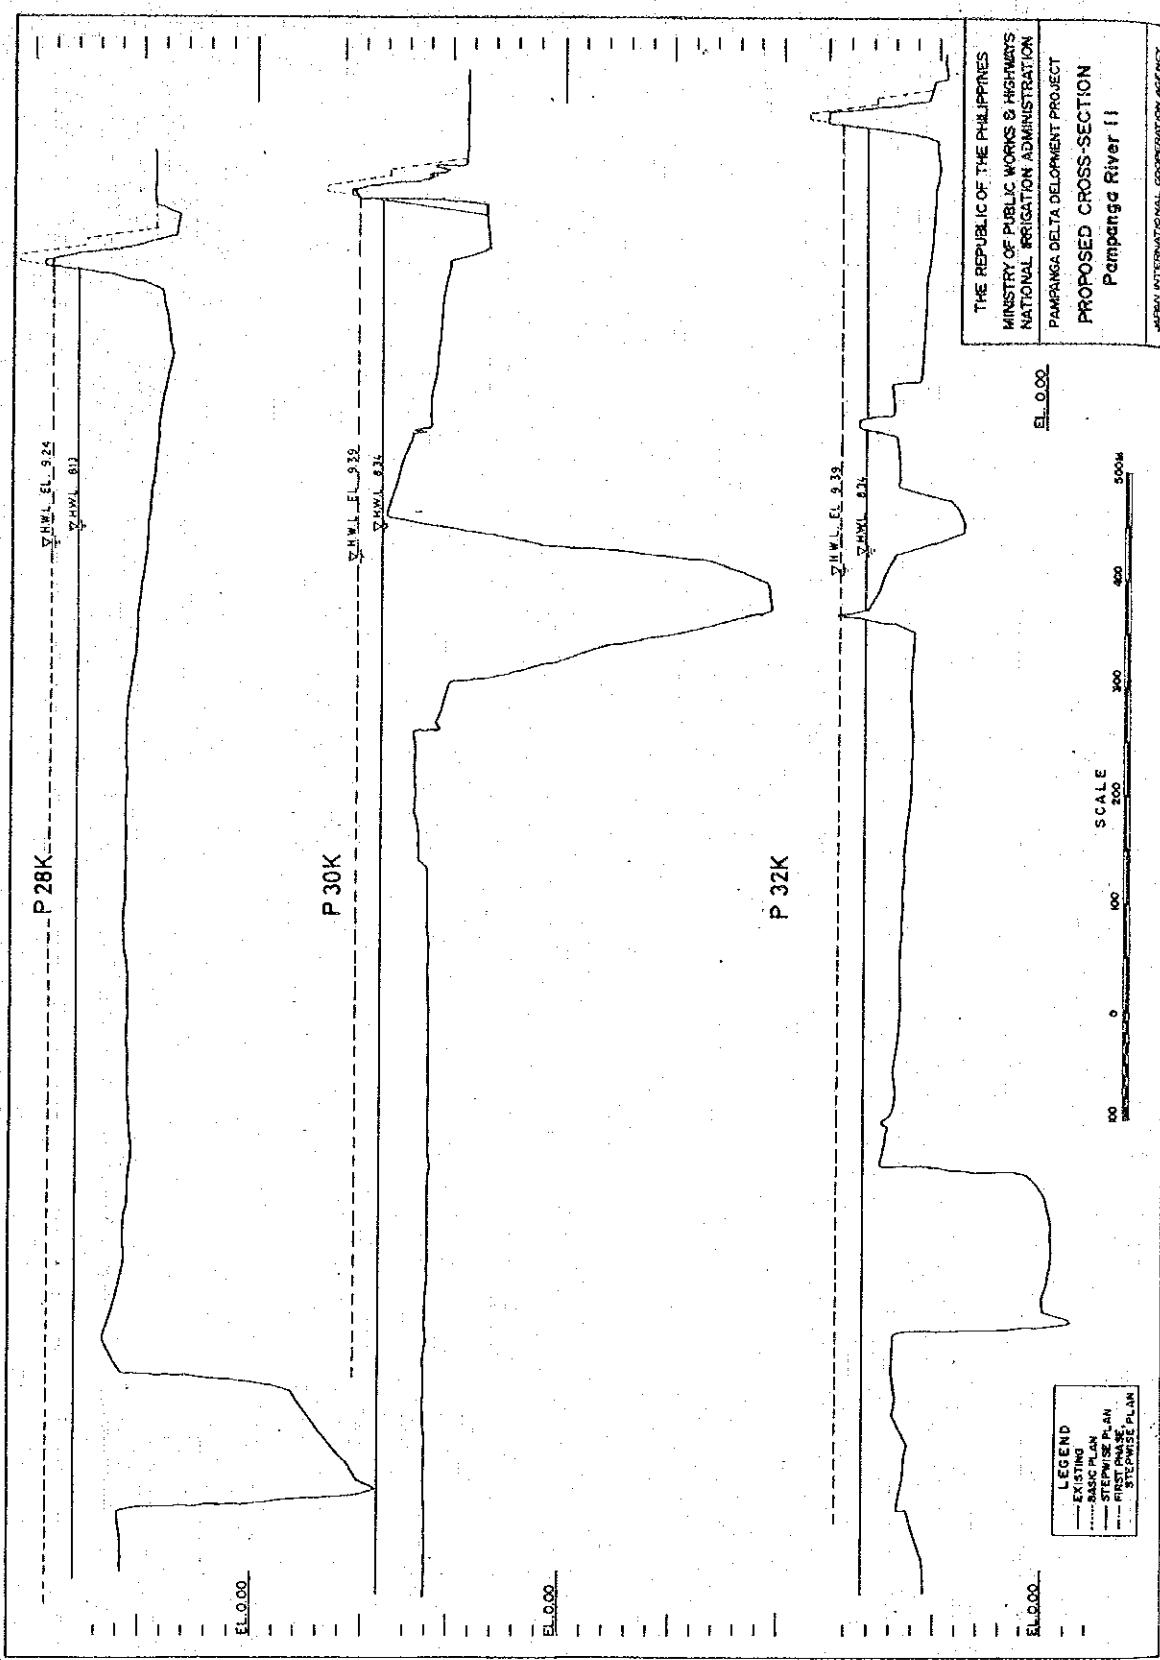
(12) PROPOSED CHANNEL CROSS-SECTION
